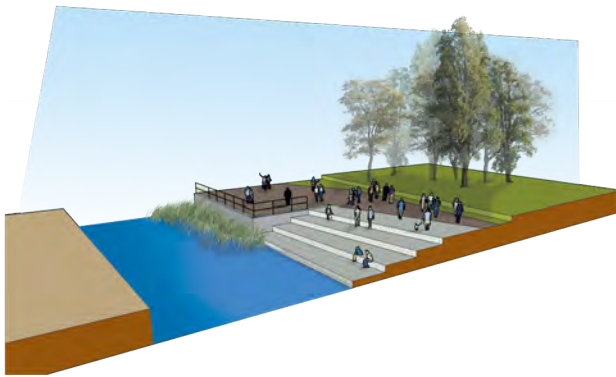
| river edges with retained wall edges, concrete construction slip access and steps
